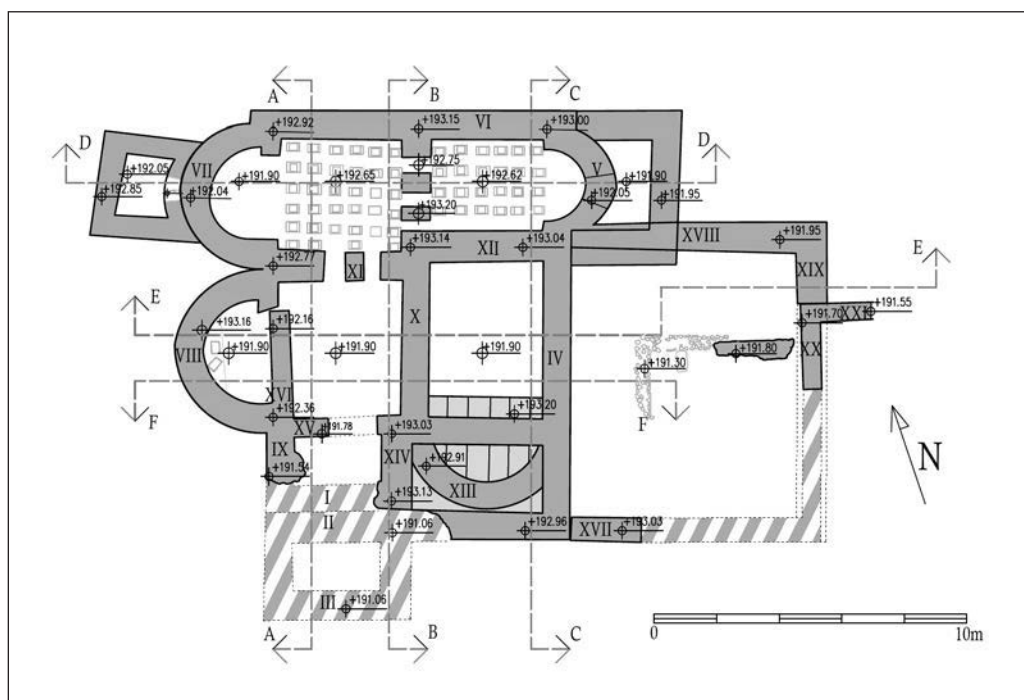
Reconstruction of the plan of the foundation of the Roman bath with the indicated levels, the numbering of walls, and sections
